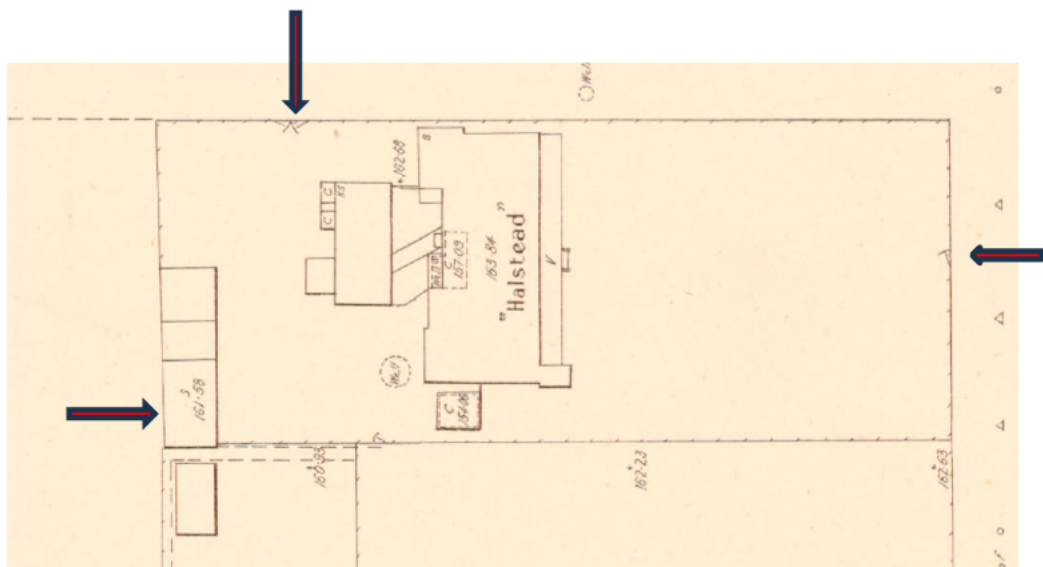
Melbourne and Metropolitan Board of Works Detail Plan 2045 Town of Caulfield. 1911.
